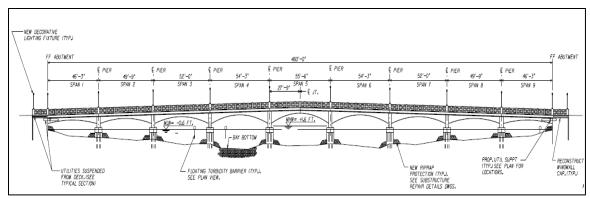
Venetian Causeway Bridge 12 (8DA14384), Elevation View
